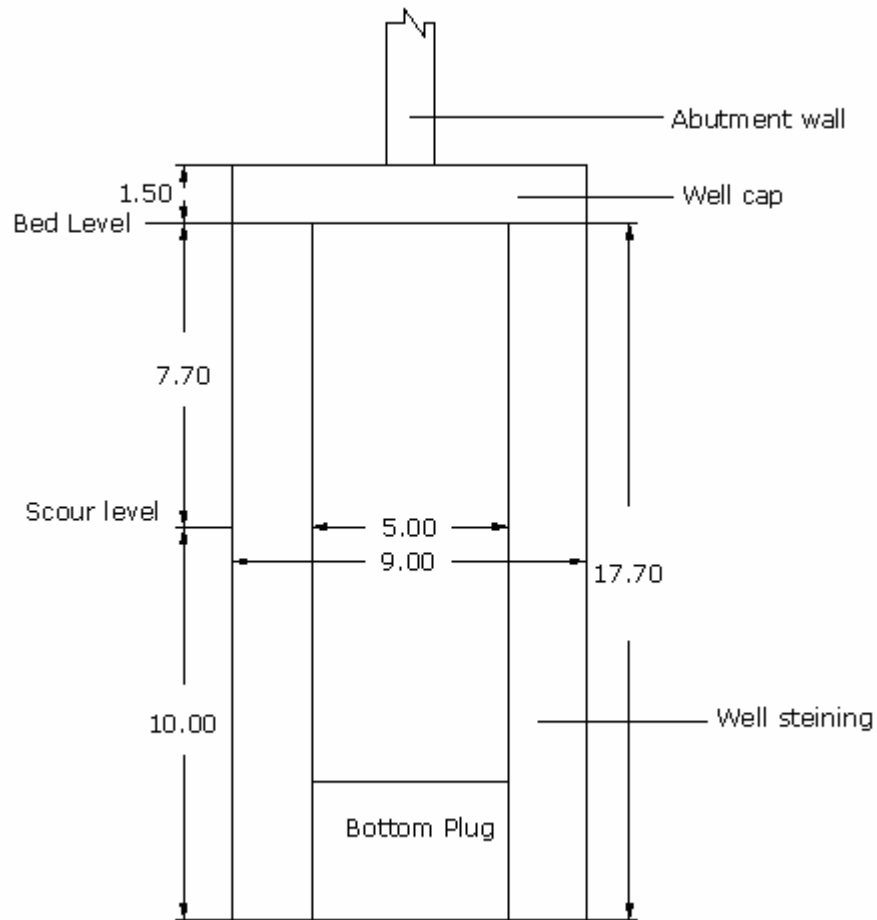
CROSS-SECTION OF WELL FOUNDATION
